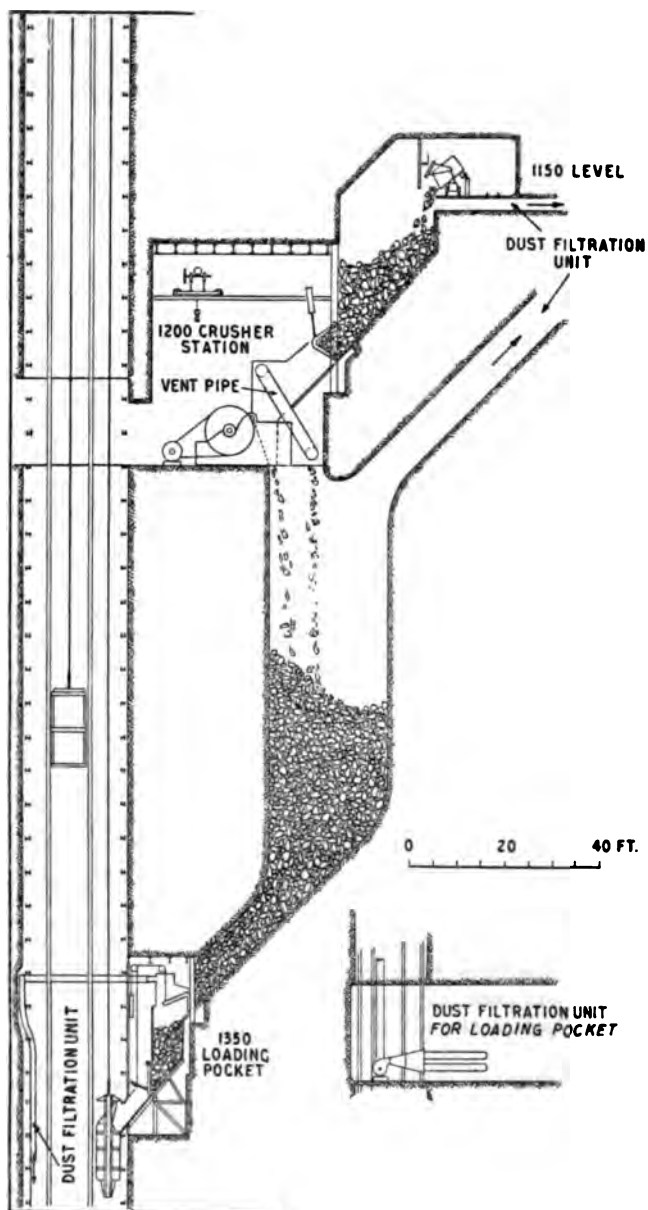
General arrangement of 1,200-ft. crusher station and 1,350-ft. loading pocket at Selkirk shaft.
